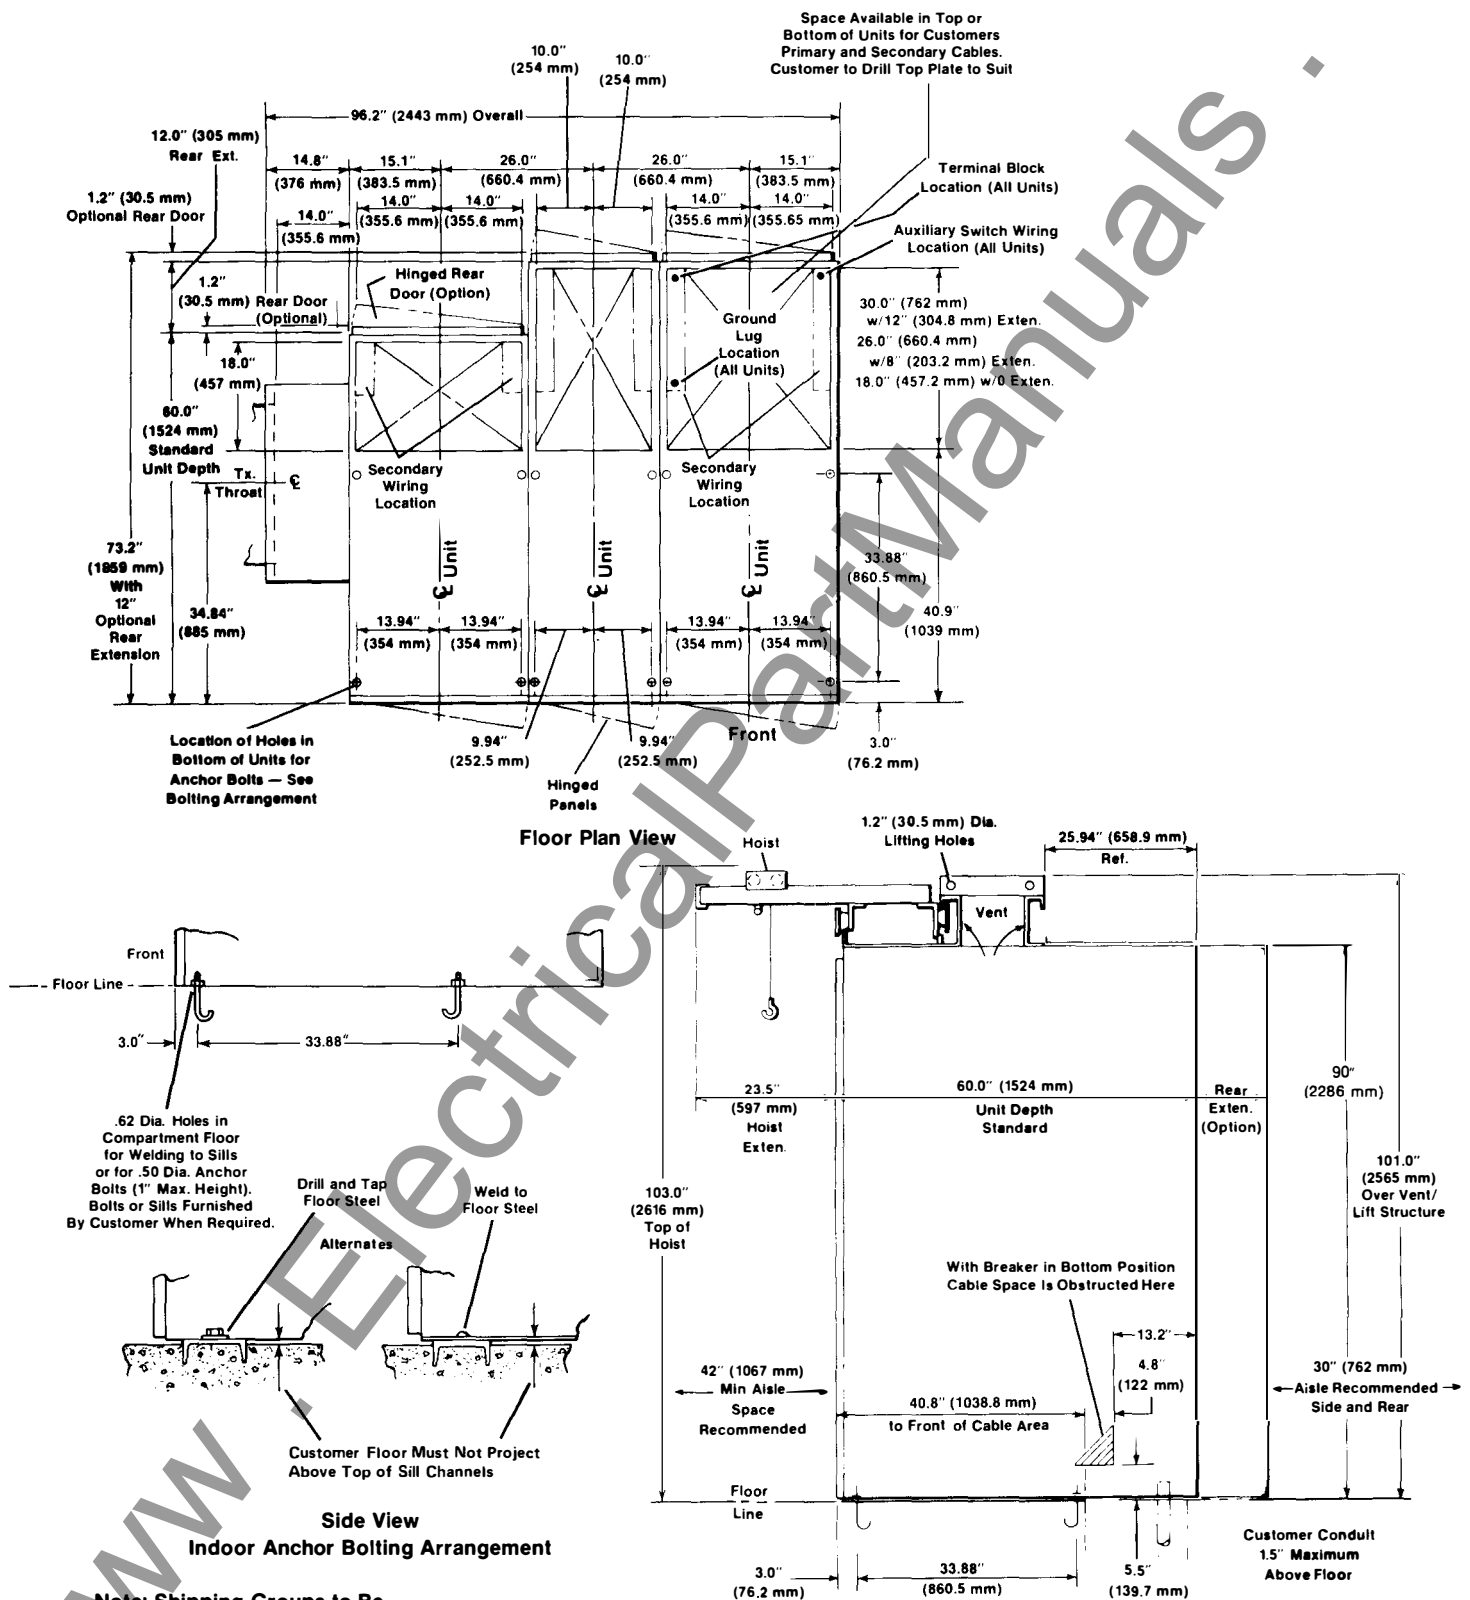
Dimensions, Floor Plan and Side View Type "R" Indoor Switchgear.
